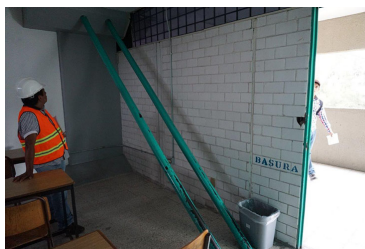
Building D - Cable bracing and connection through slab-column joint.
